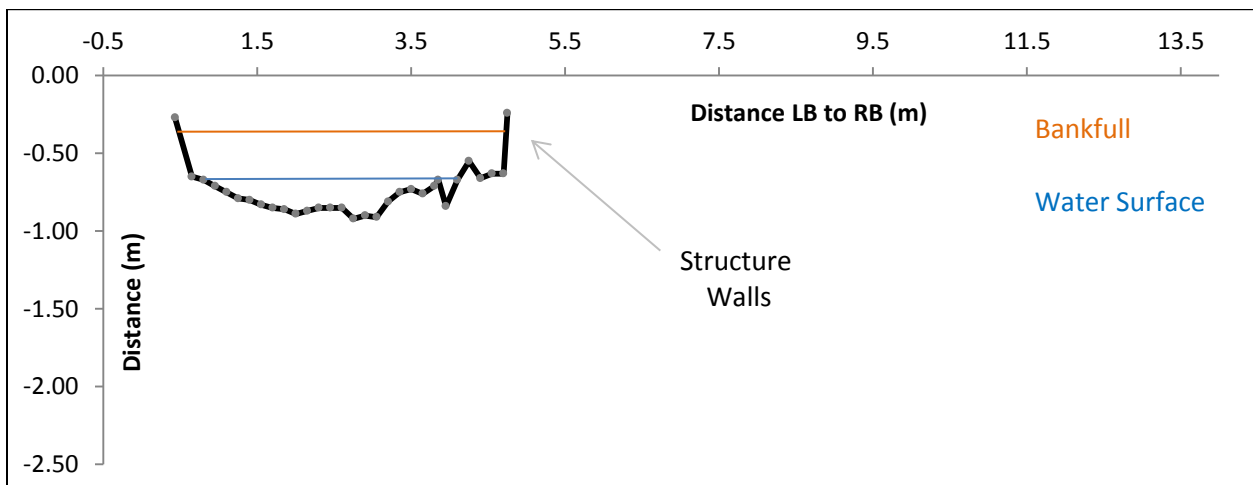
SPARKS BROOK CROSS SECTION 6; 1/2 WAY INSIDE CULVERT; SR1 = RIFFLE RUN
